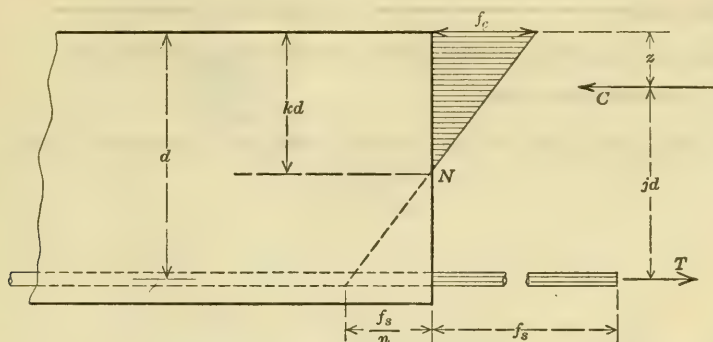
NOMENCLATURE FOR CONCRETE BEAM REINFORCED FOR TENSION.
